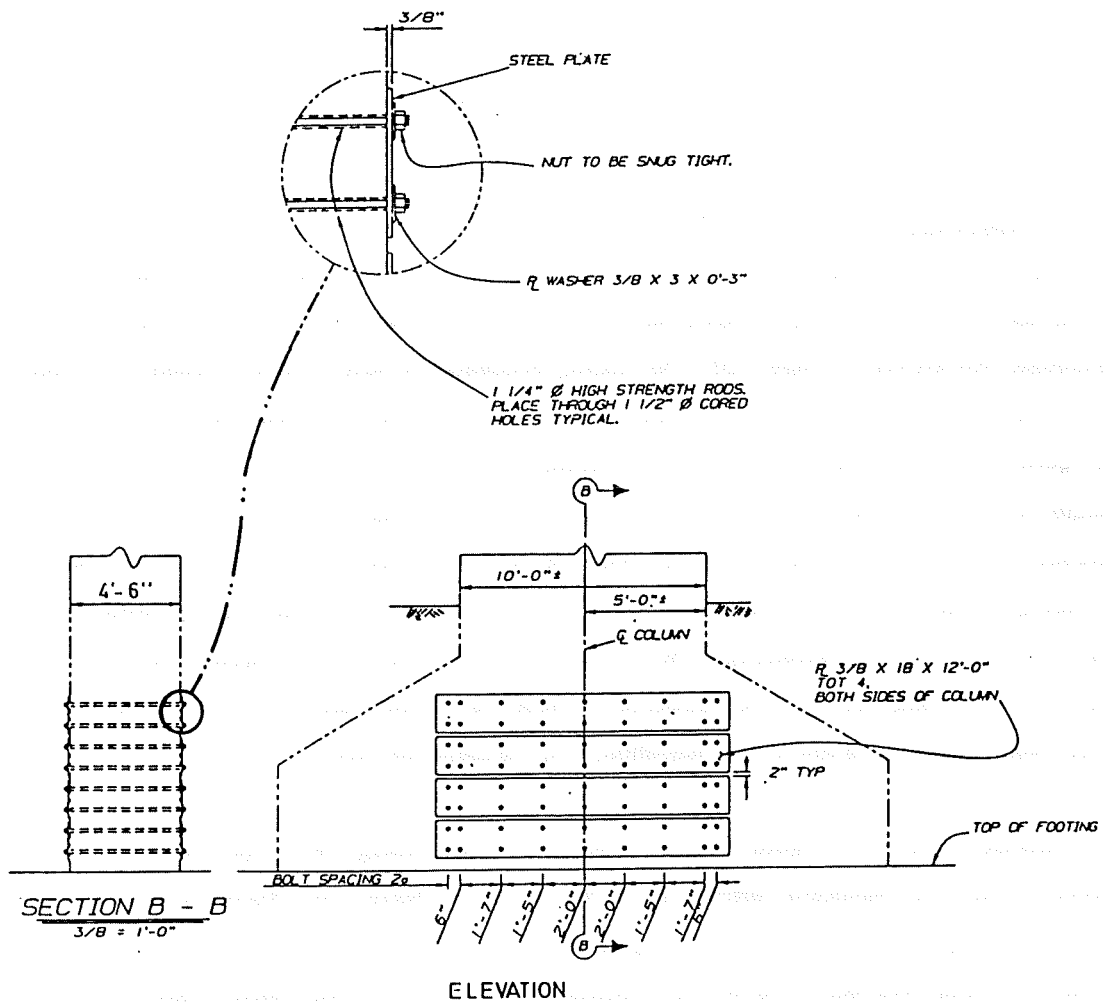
Column or pier wall retrofit using confinement plates at the lap splices [Zelinski pers. comm. 1993].
